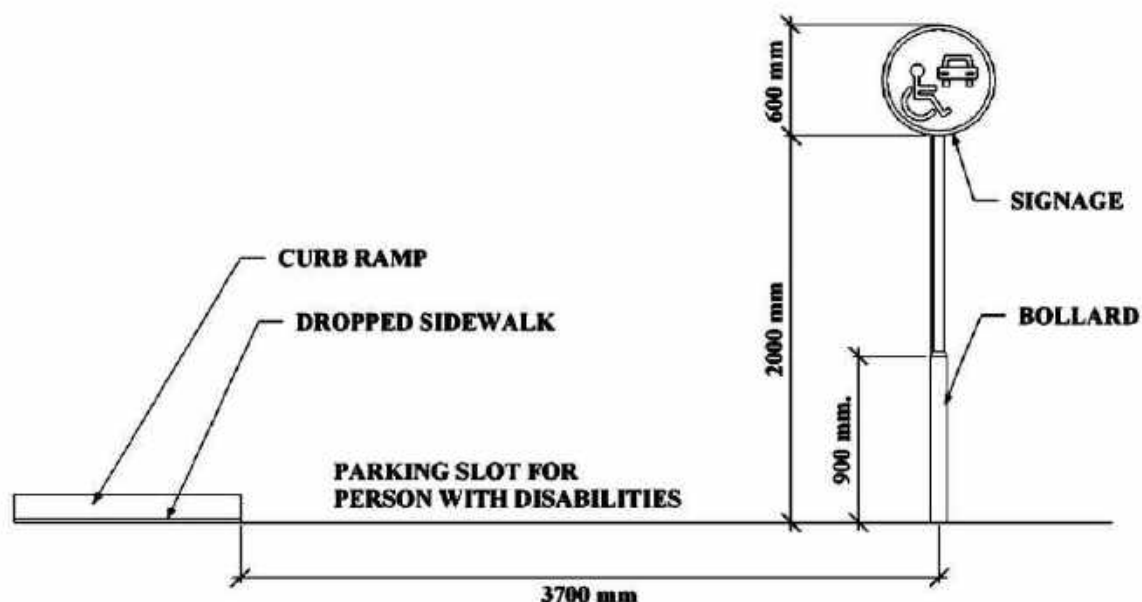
Accessible Parking Slot with Upright Pole-Mounted Signage
